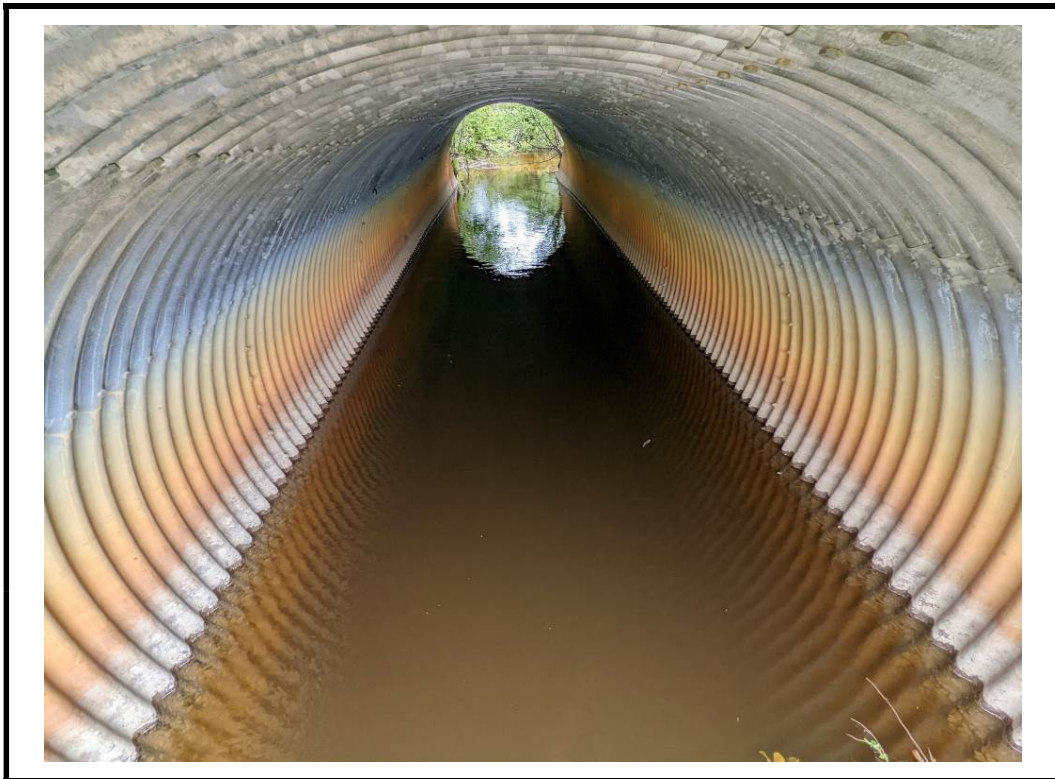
Light corrosion noted at waterline in north culvert barrel (Typical)
